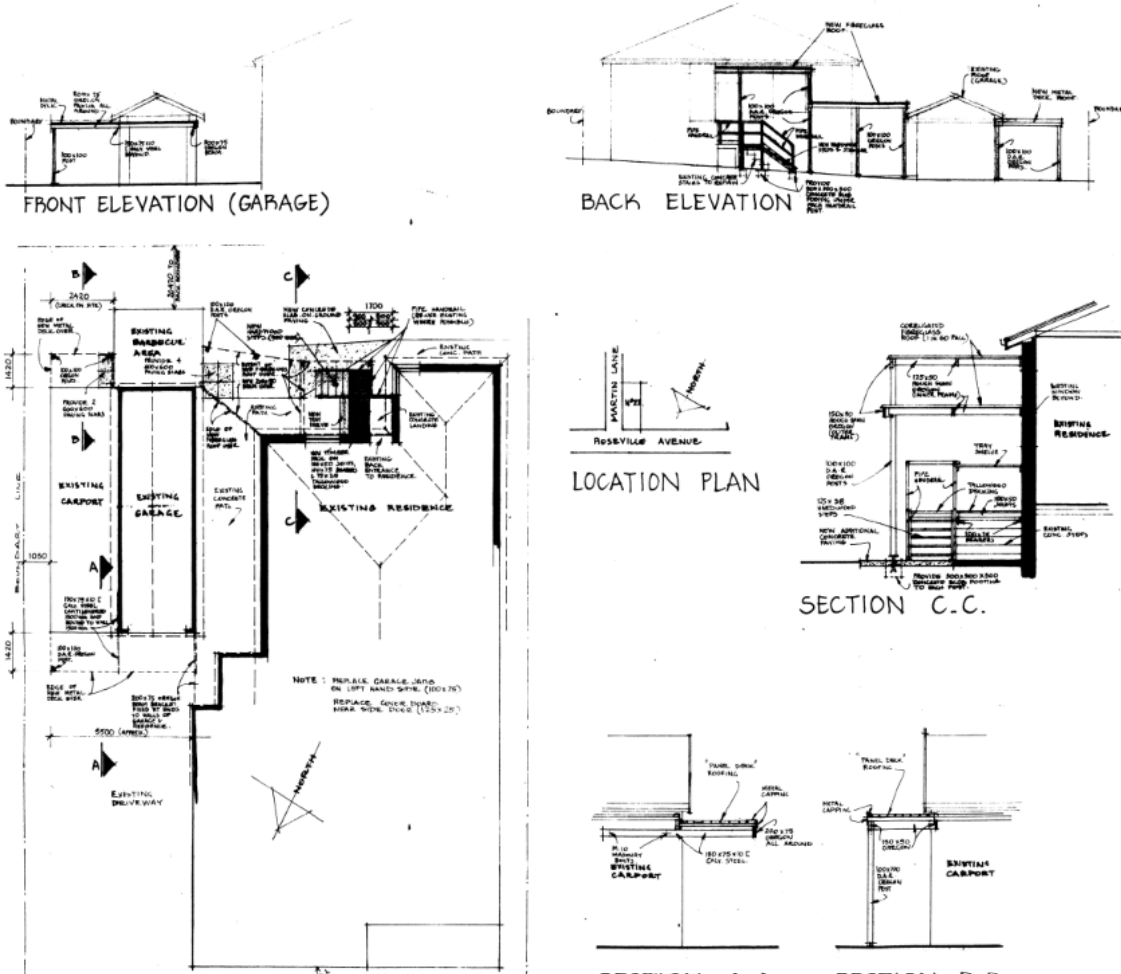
Plans and elevations for establishment of rear covered outdoor entertaining area dating from 1981
